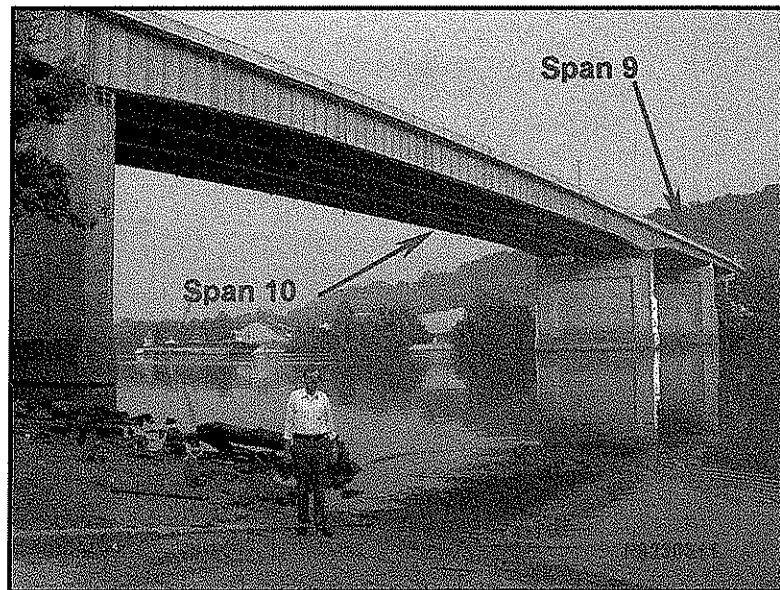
Photograph of elevation view of upstream face of bridge
